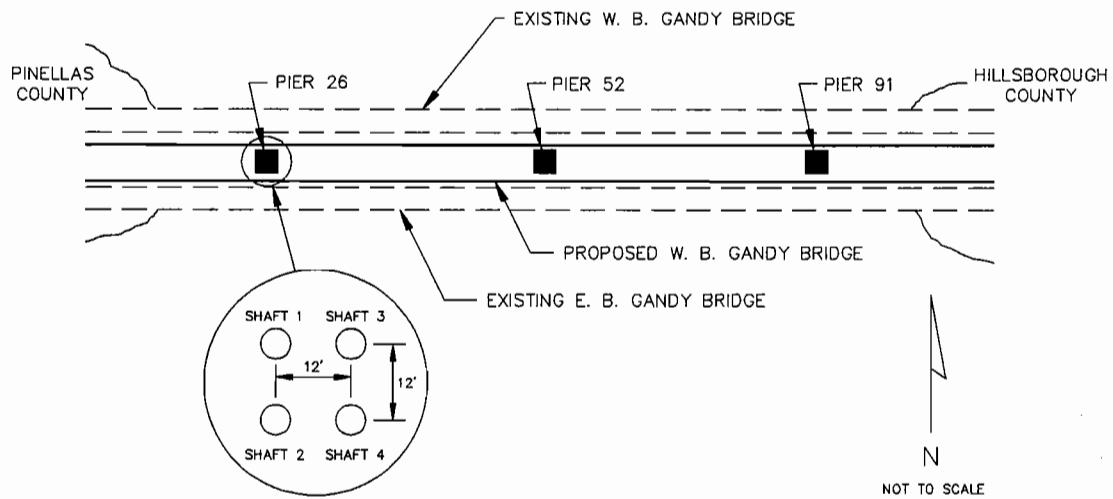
Test Locations for Westbound Gandy Bridge Site.
